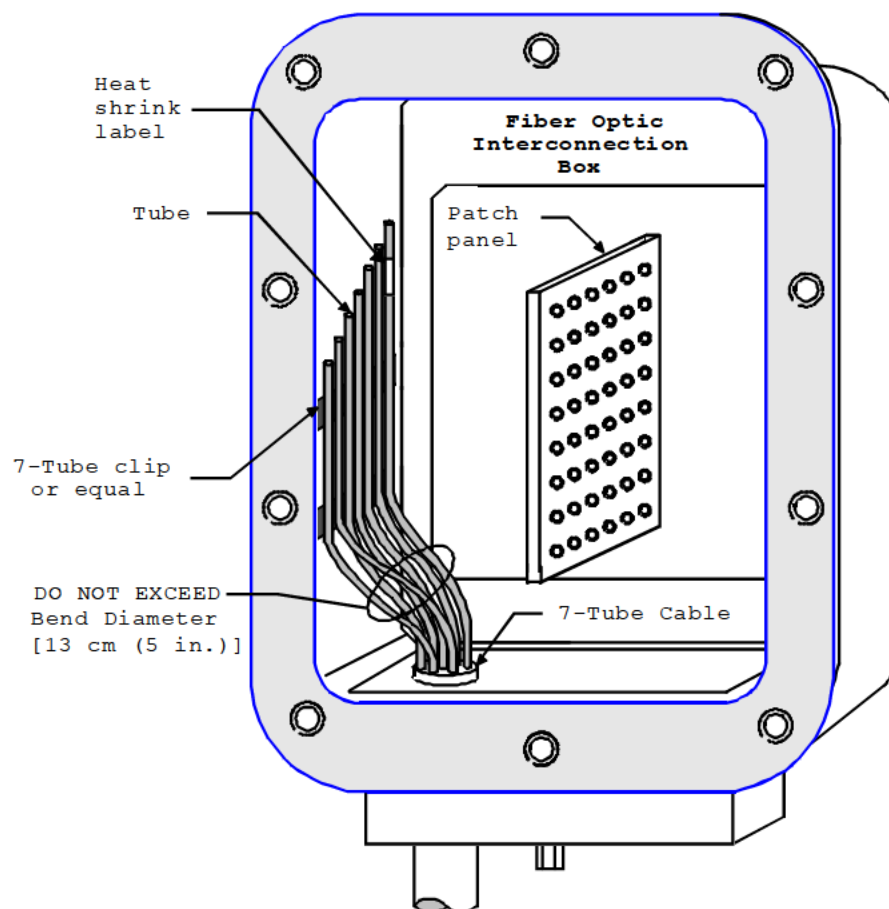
I2-1. Routing BOF tubes in an FOICB.
